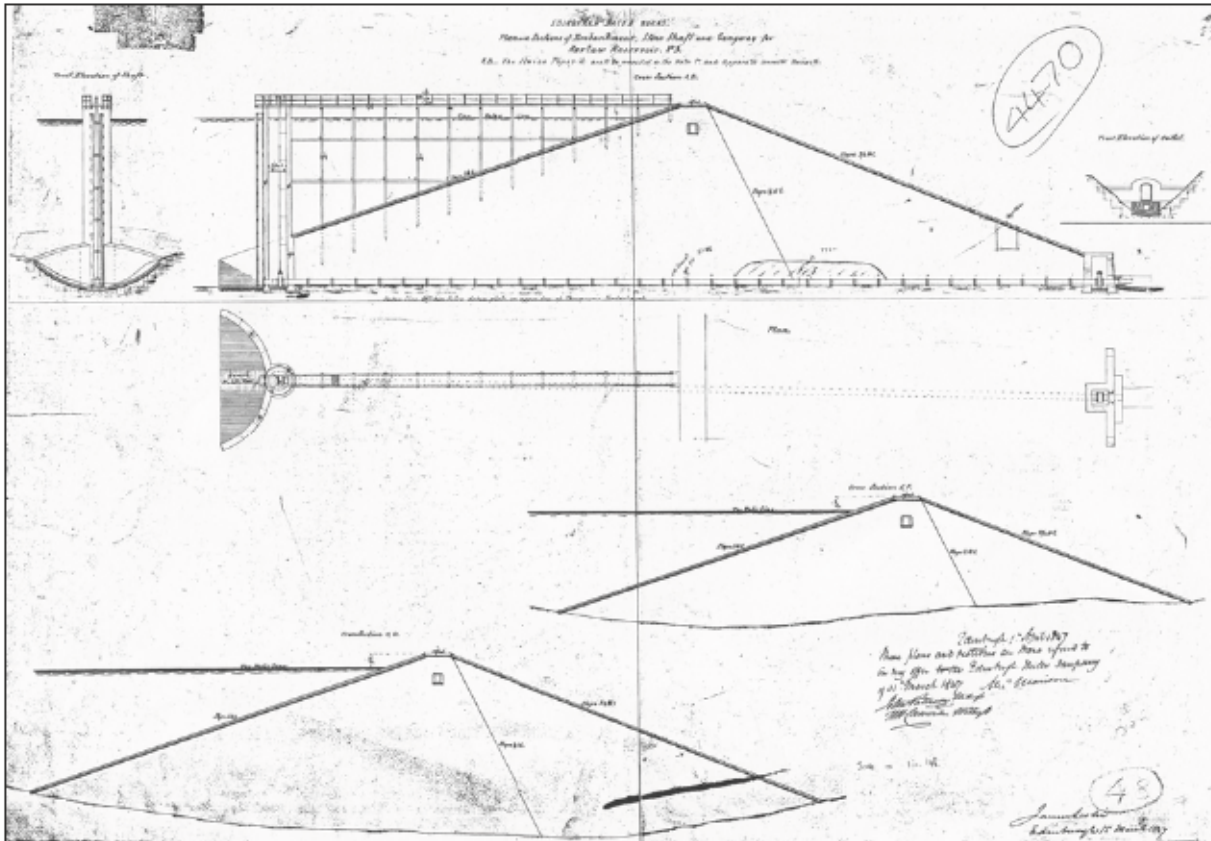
Plan with Sections of Embankment Stone Shaft and Gangway.
